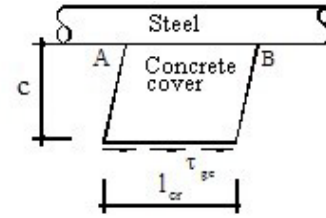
FIGURE IV. THE STRESS OF CONCRETE COVER BETWEEN ADJACENT CRACKS
